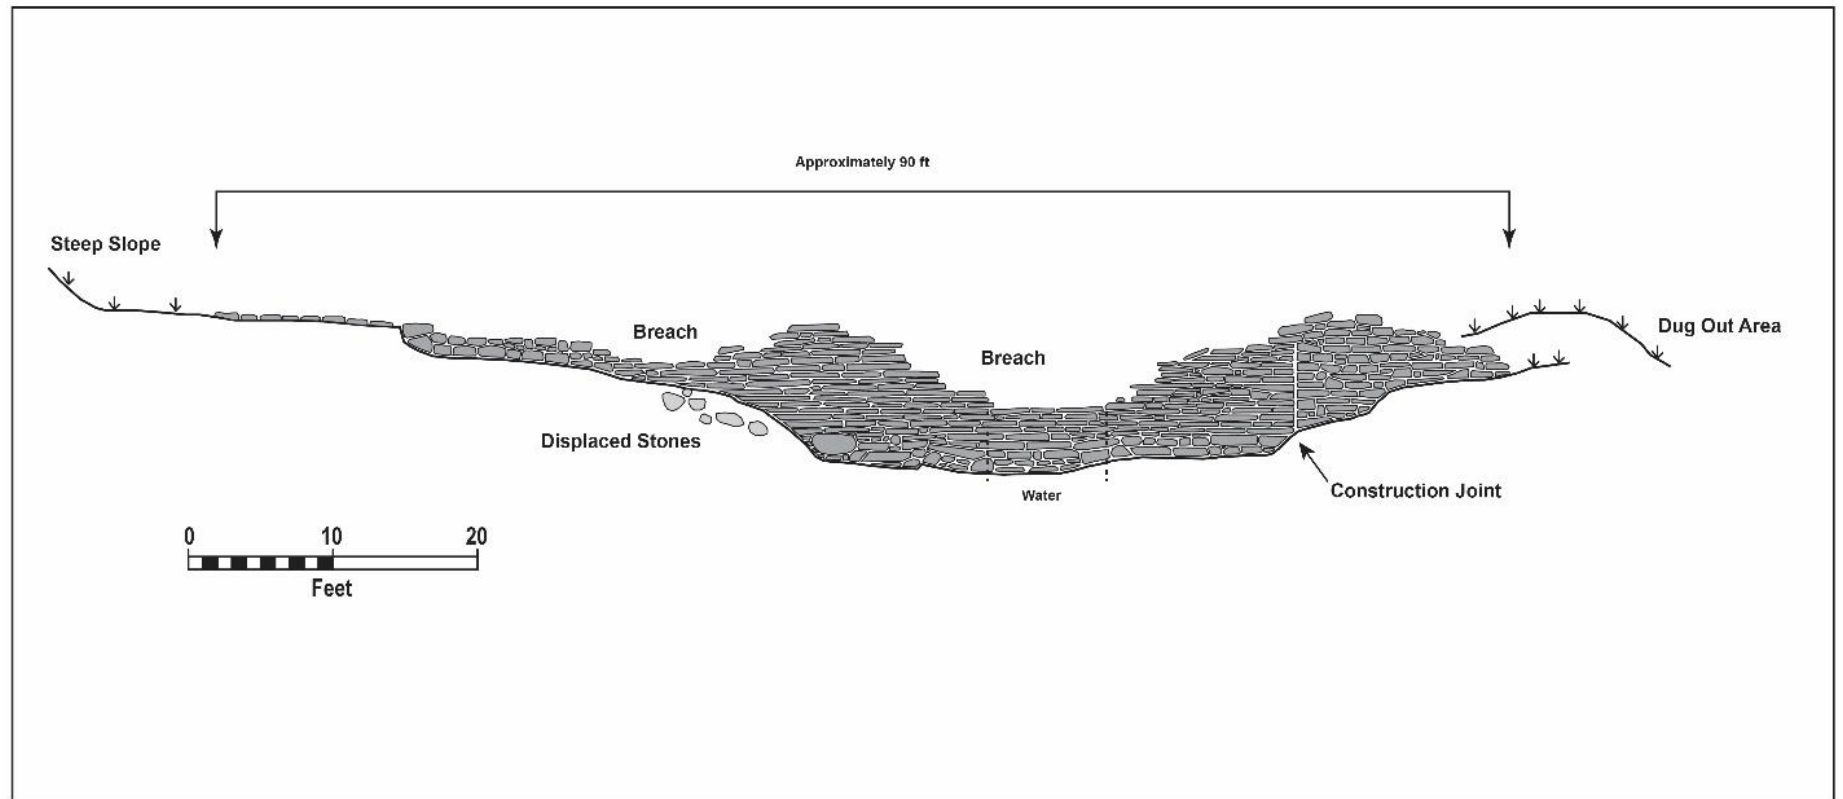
Downstream sketch elevation of the Maple Corner Dam.
